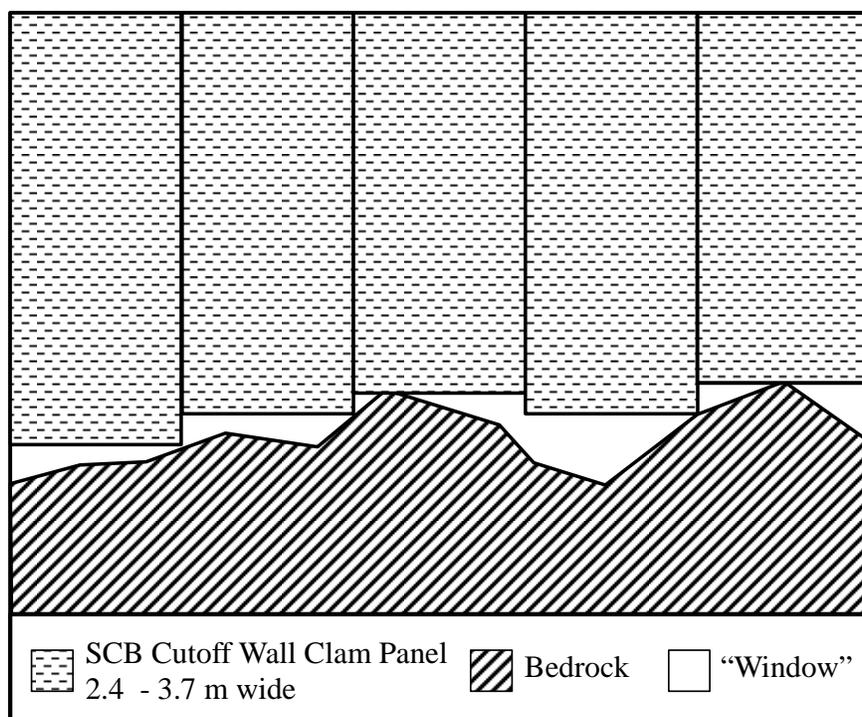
Schematic of Potential “Windows” Beneath the Cutoff Wall (not to scale)
